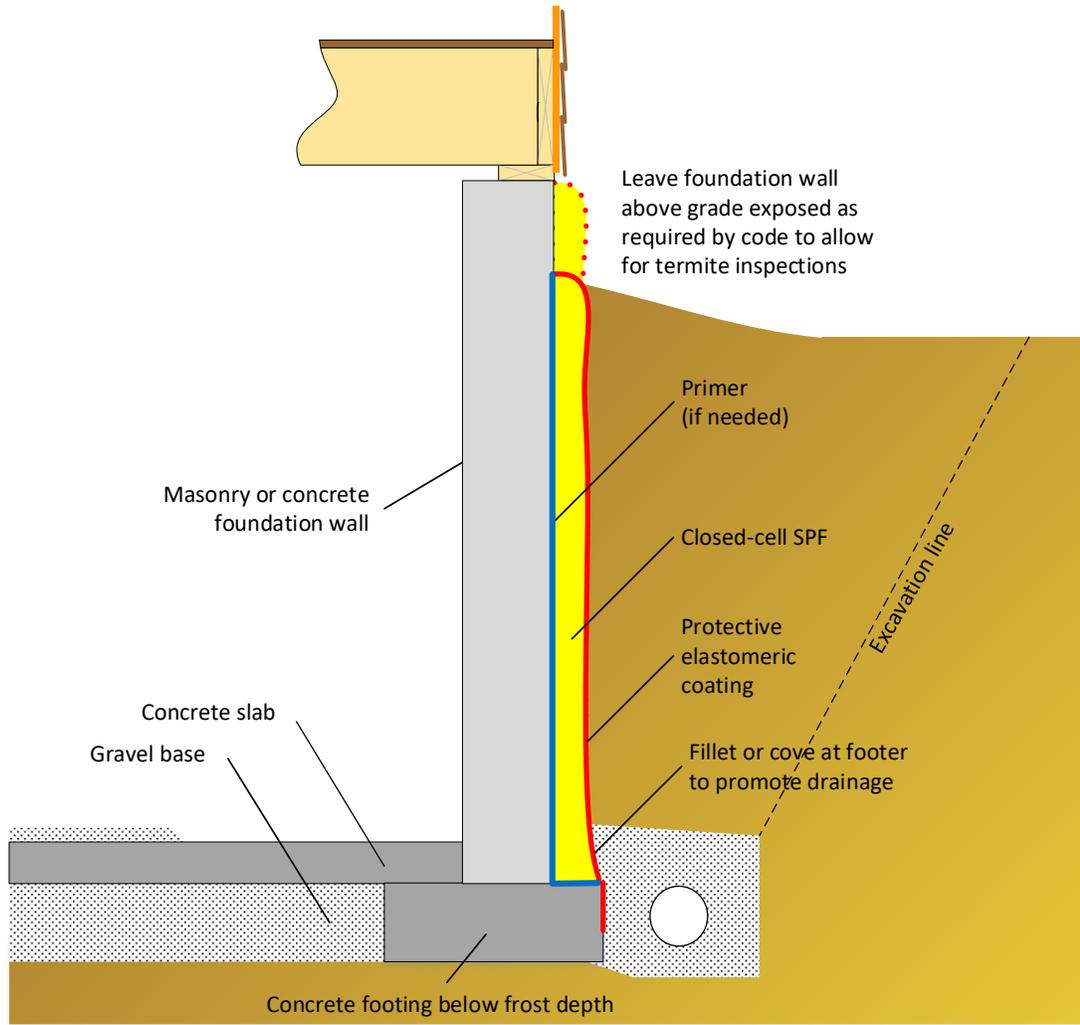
Exterior below-grade wall installation: optional protective/drainage boards not shown
